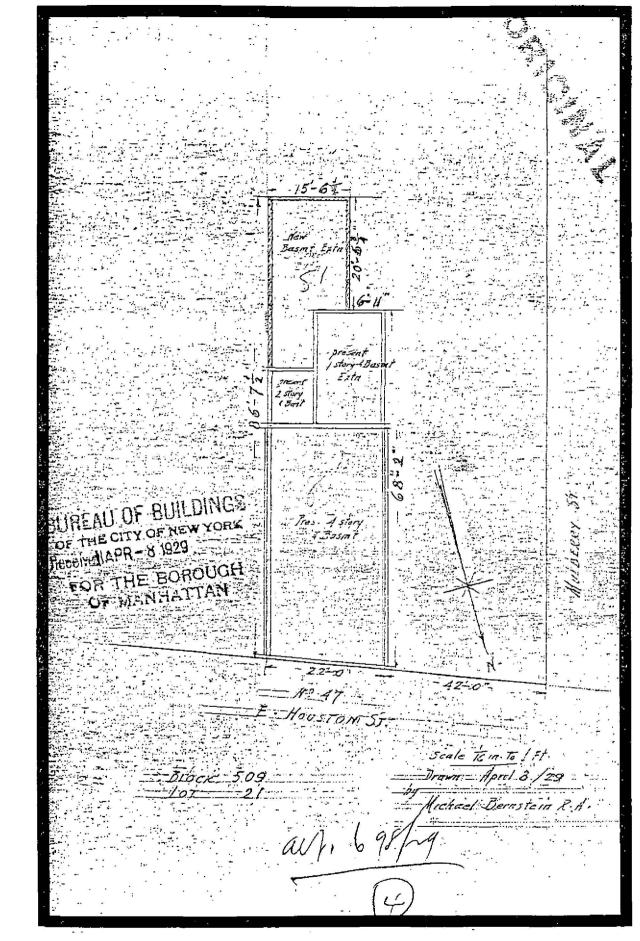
Copy of 1927 alteration plan showing extension of basement on Lot 21 in Block 509.
